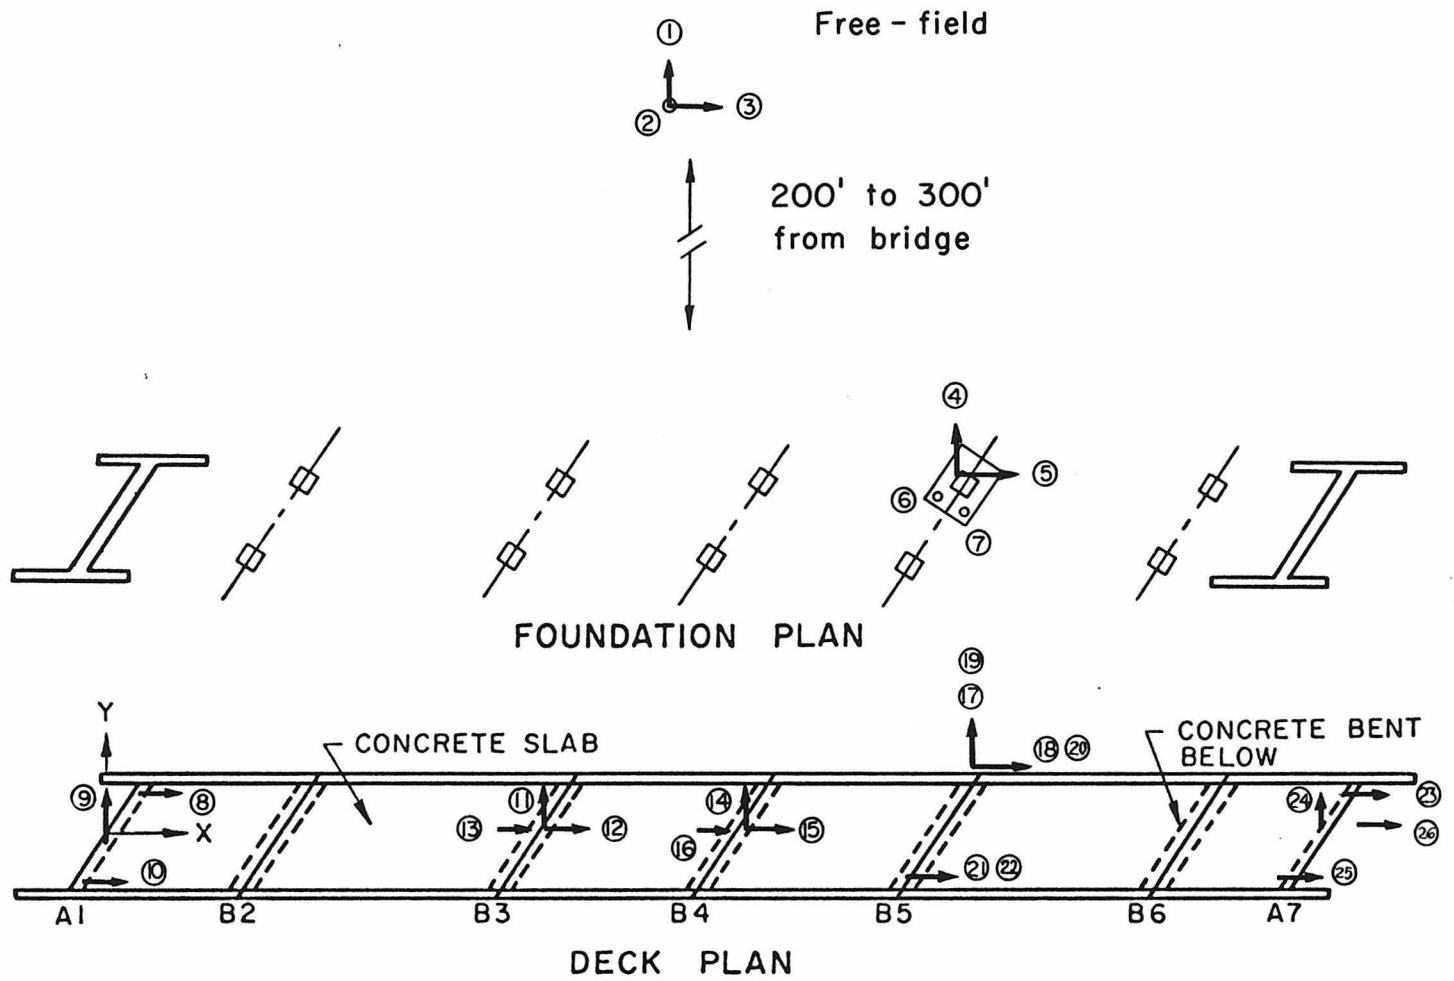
A Recommended Plan of Instrumentation for the San Juan Bautista Bridge
